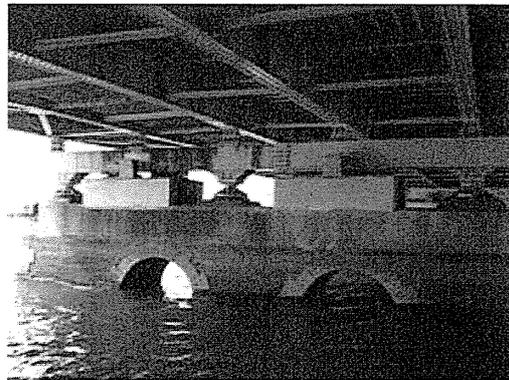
Raising bridge floor bottom by a steel beam. The bridge has been subjected to gradual settlement and vulnerable to raising sea surface.
